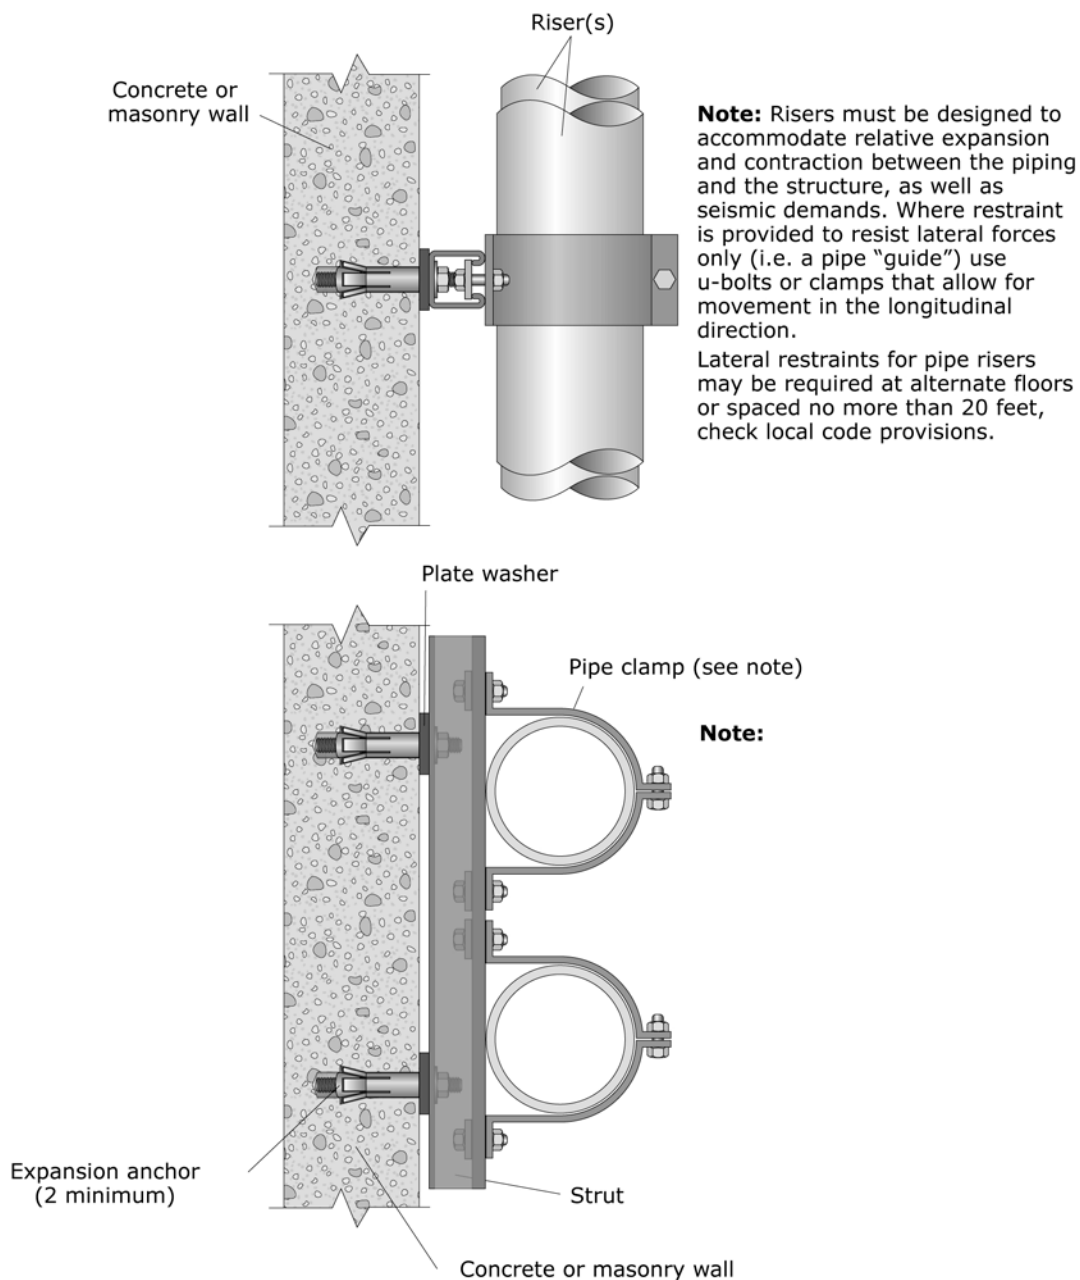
Wall-mounted pipe riser restraint/support (ER).
